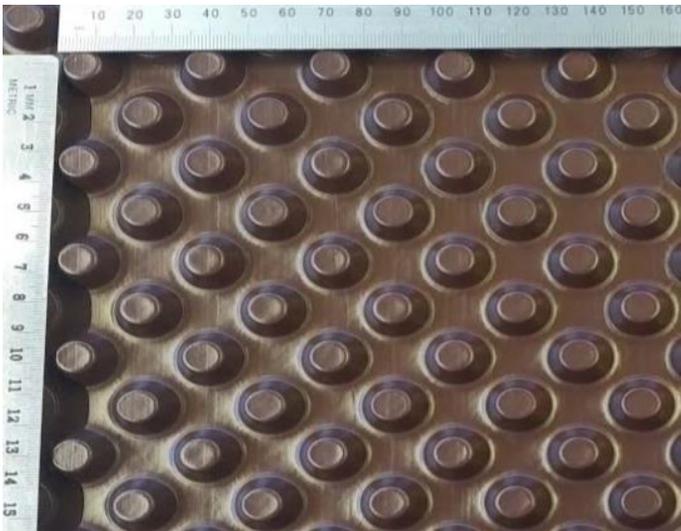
“DELTA[®]-MS” dampproofing membrane – face in contact with the wall
